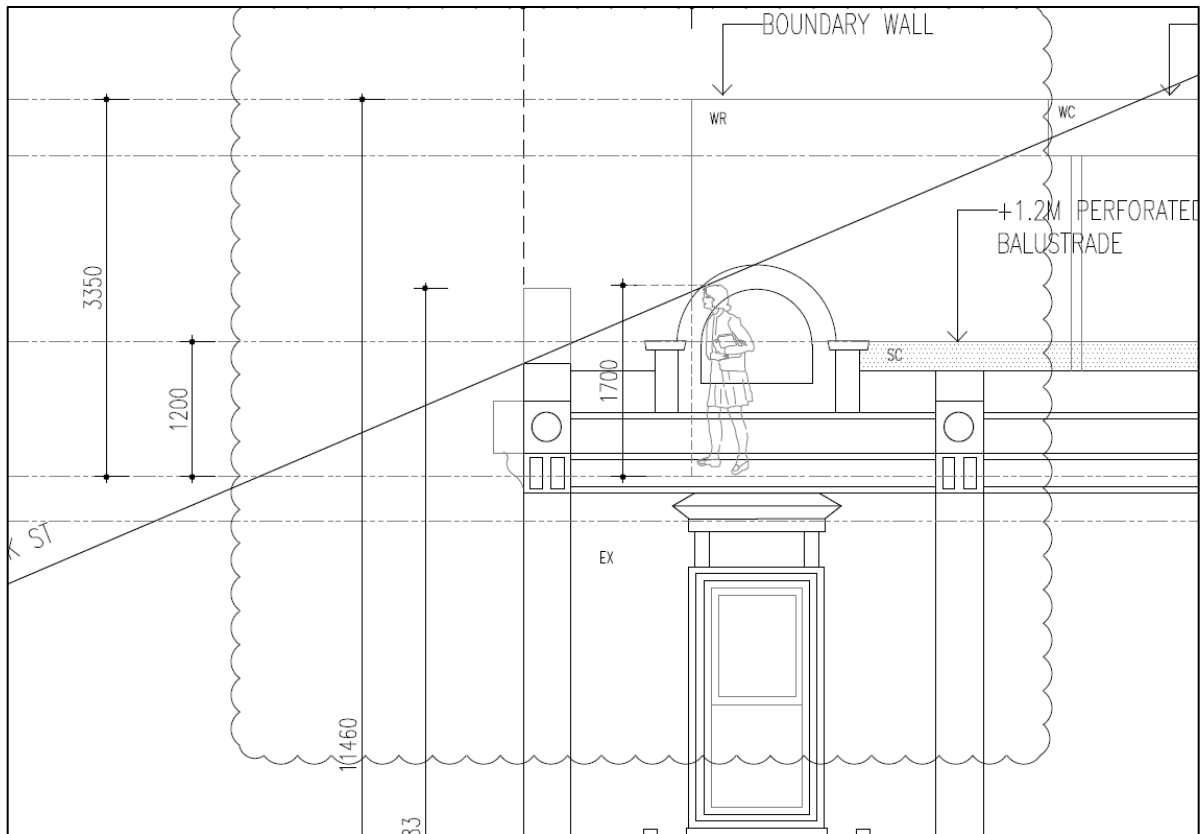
Enlarged cut out of Sightline diagram from Brunswick Street - Sketch plans (29 Sept 2020)
